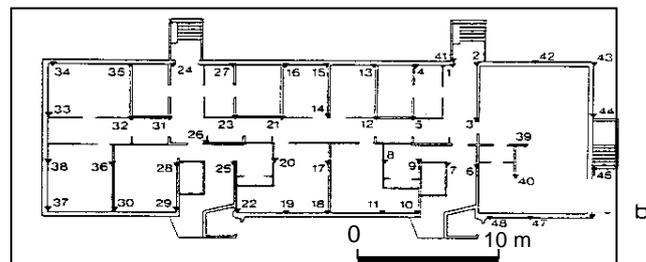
House in Uppsala (modified after Van Impe, 1999)
